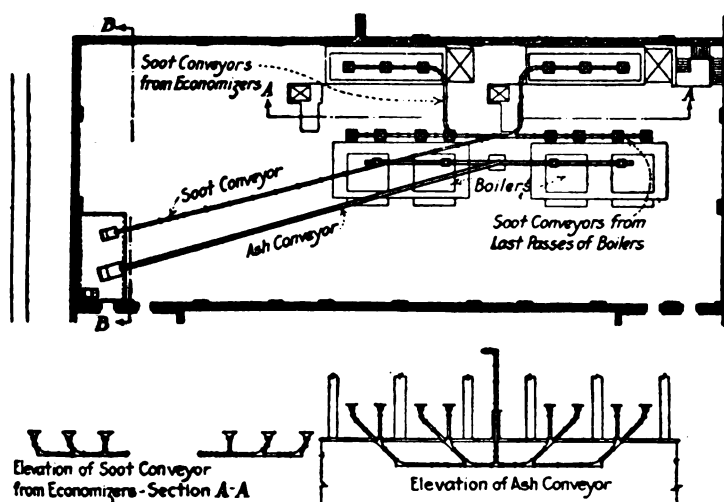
Air conveyor at Milwaukee sewage-disposal power plant. Plan.
